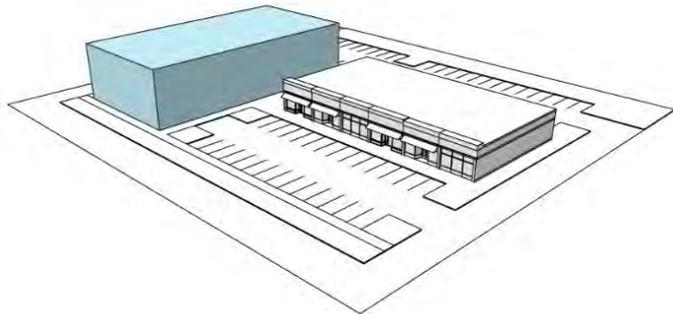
DEVELOPMENT SITE BUILDING ENVELOPE
